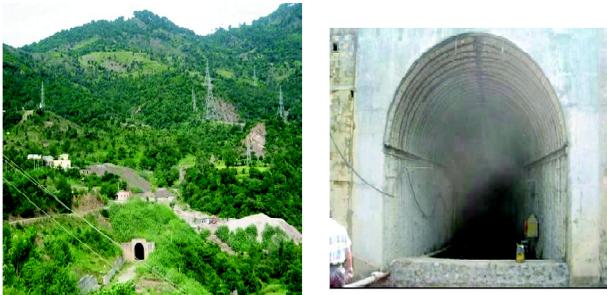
Tunnel T-1 in Udhampur - Katra Section
